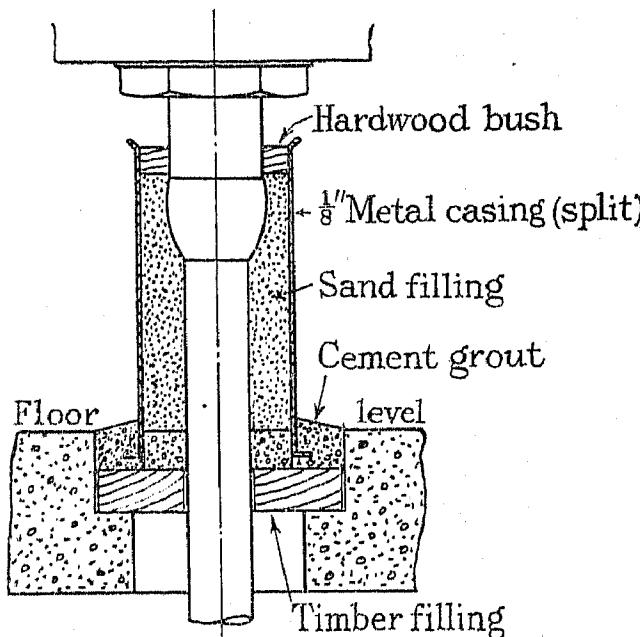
Arrangement for fire protection of cables connected to switchgear.
